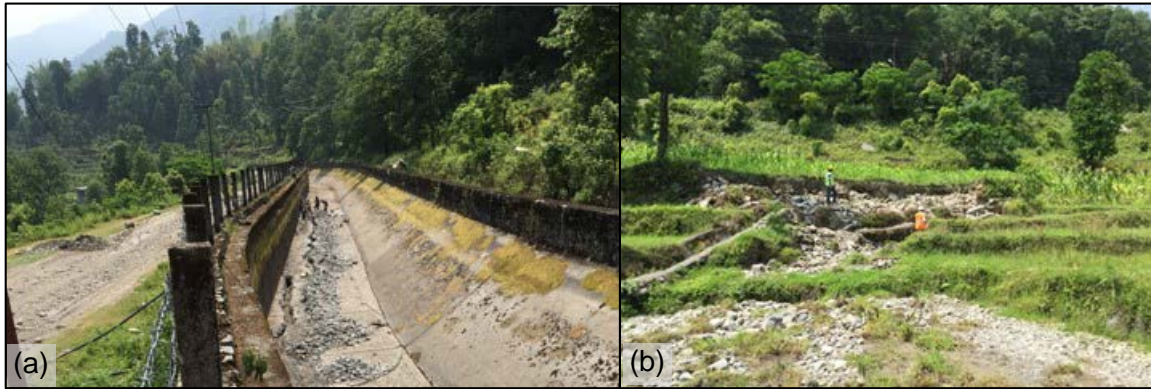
Cracking observed in canal (left). Water from cracked canal is expected to have saturated soil and contributed to slope failure downslope of the canal. The photo at the right shows where canal water drained out of the hillside below the canal. (a) 27°45'11.01"N, 85°50'44.07"E, (b) 27°45'11.94" N, 85°50'47.58" E
